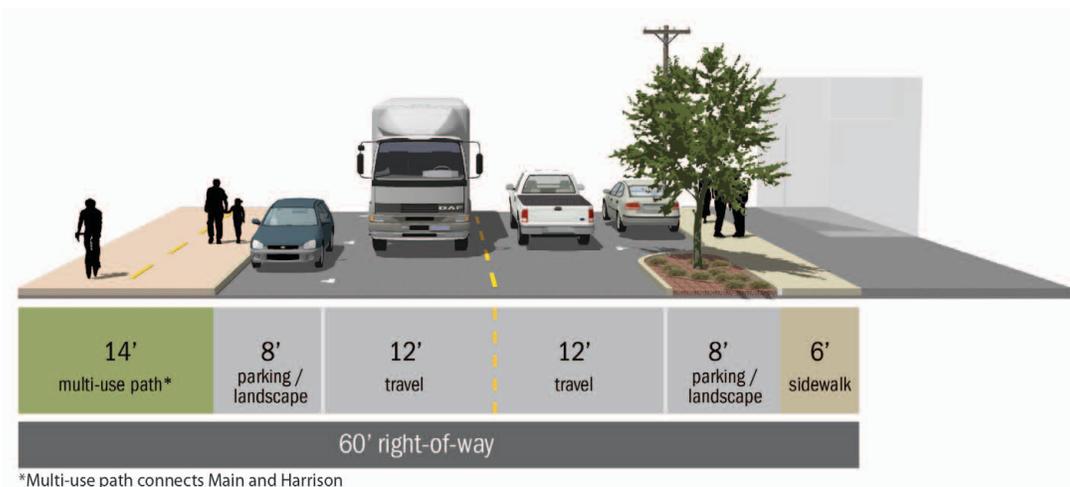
Conceptual Cross-Section for Mailwell Drive with on-street parking
